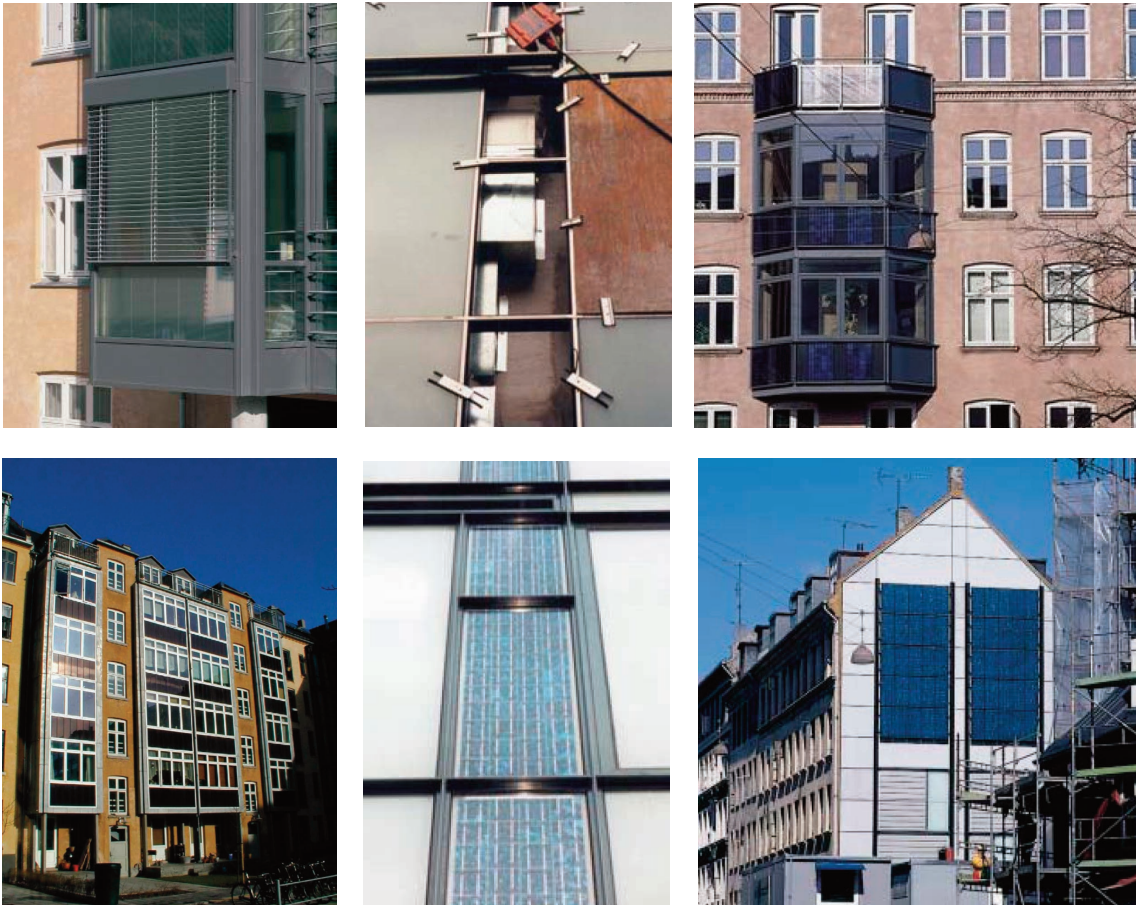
, 21, 22, 23, 24 and 25 - Flexible façades constituting by sunspaces (left), solar walls (centre) and PV panels applied on railings and walls (right)
